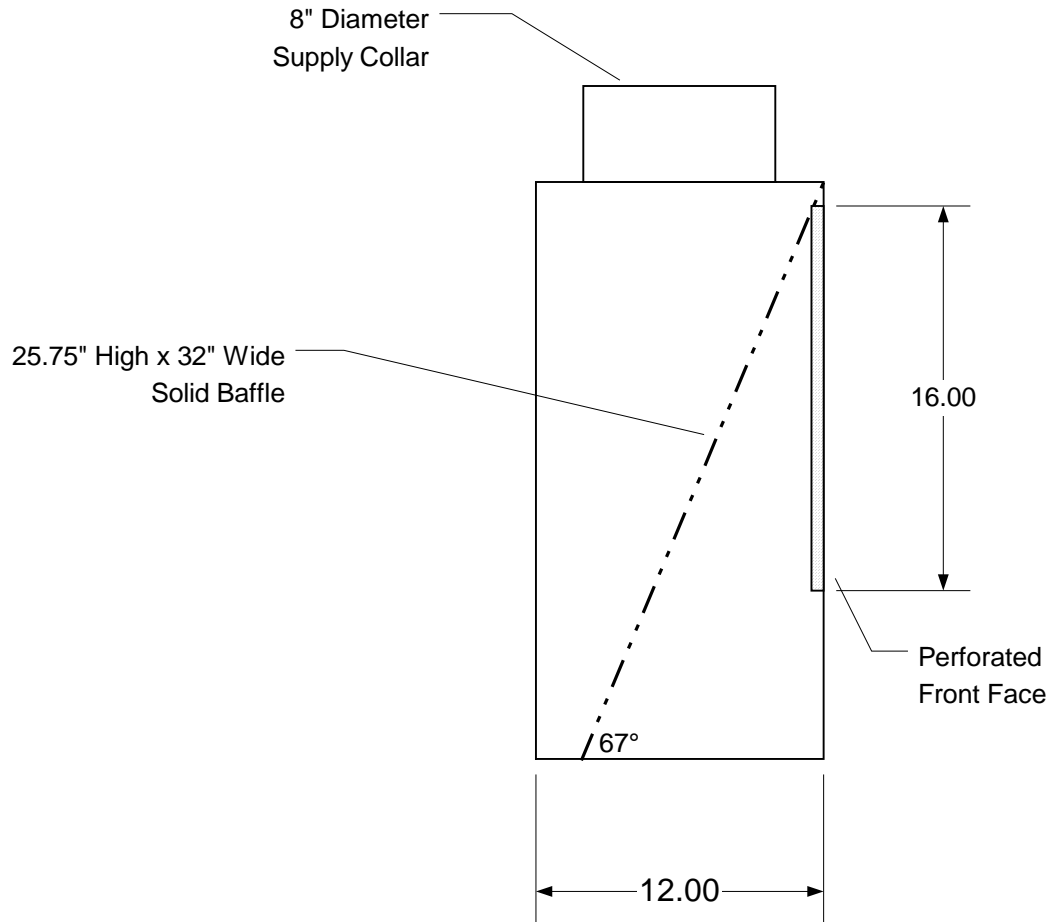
Detail Cross Section of Front Face Supply – Original and Modified Designs
